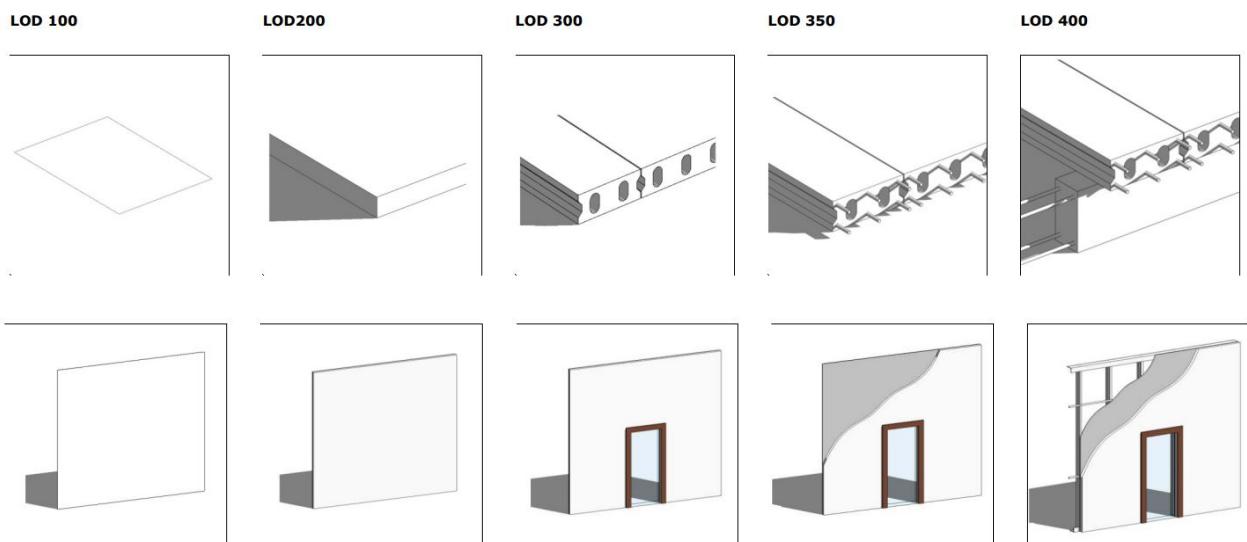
Examples of LOD in specific component types (floor slab, inner wall)
